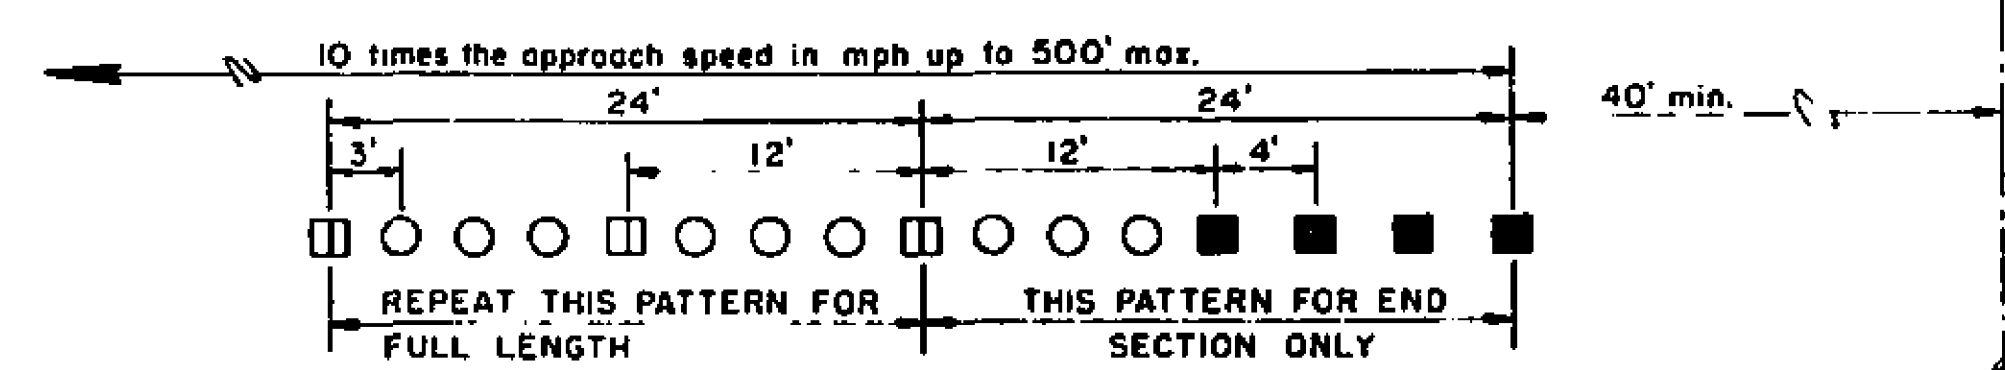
8" WHITE CHANNELIZATION STRIPE
